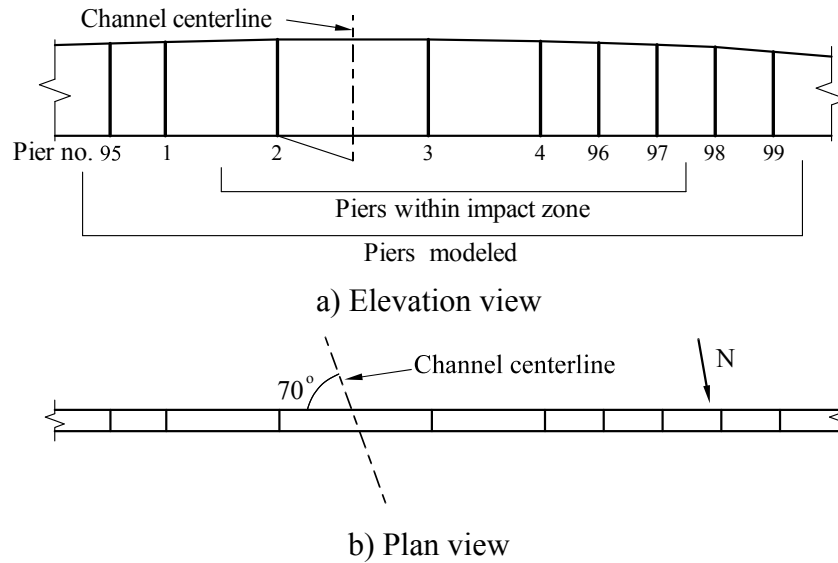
High-rise portion of LA-1 Bridge, showing piers at risk for impact
